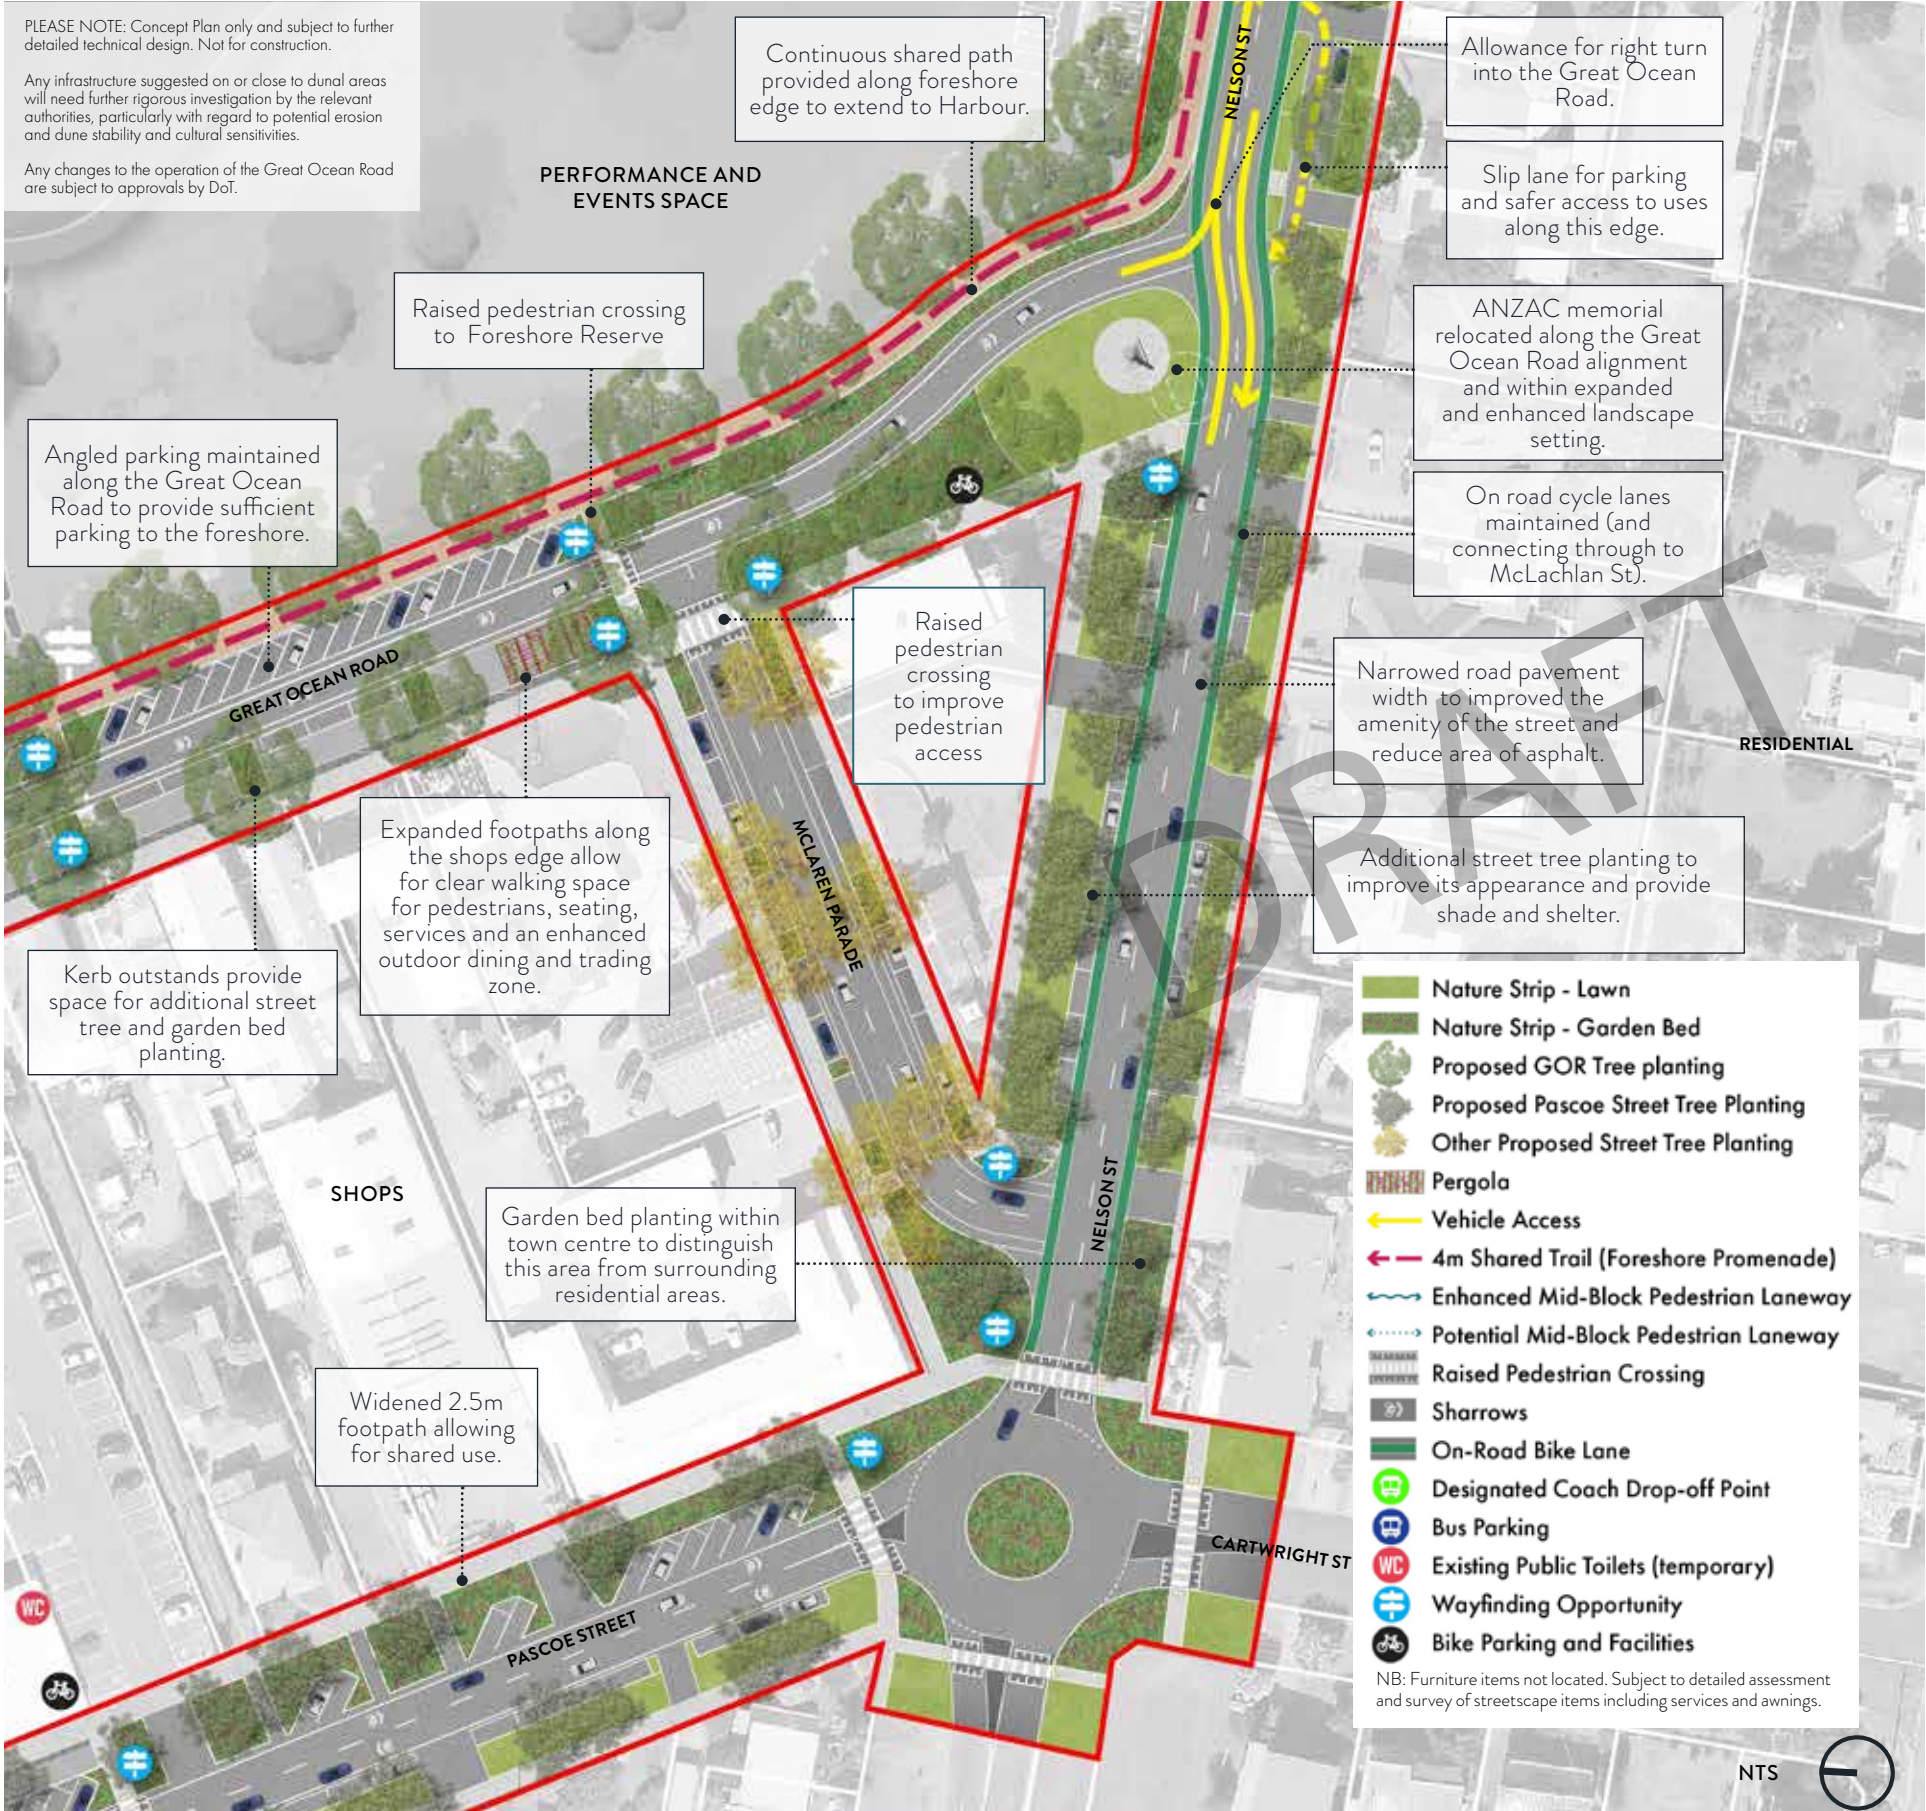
Detailed Streetscape Plan 3 - Option 1 - One-Way
